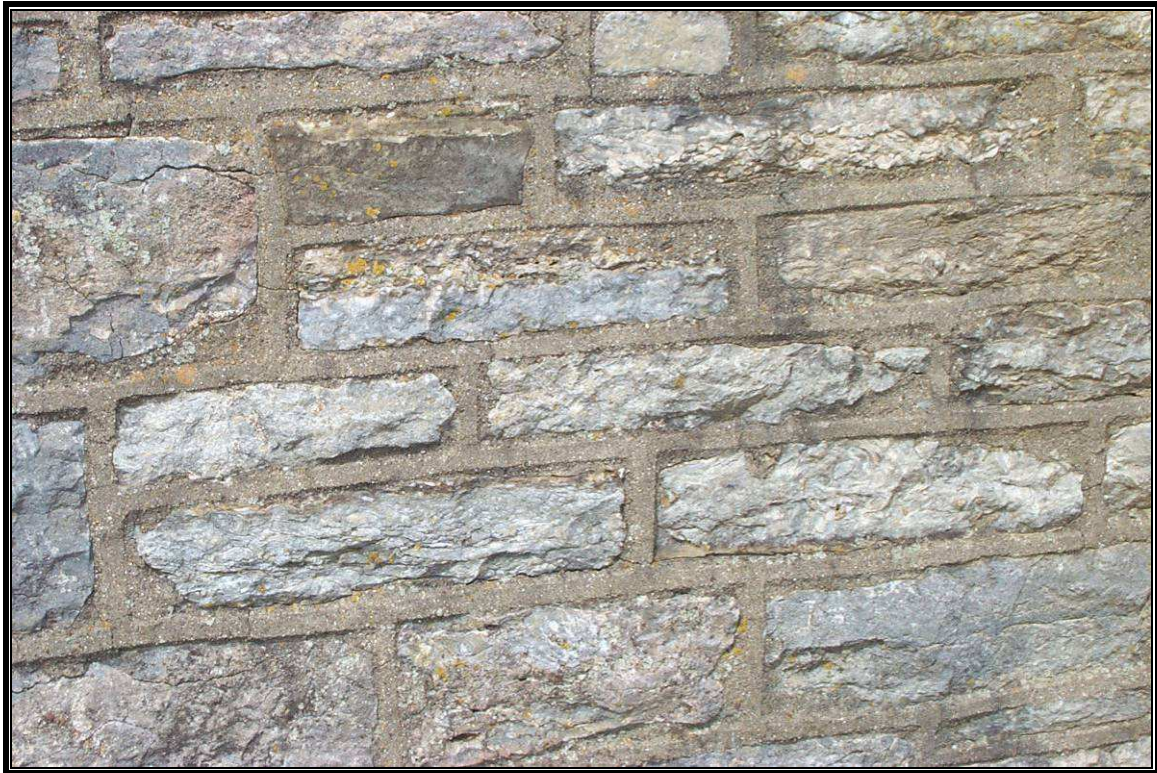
Site 116, Detail of raised, squared mortar joints.
